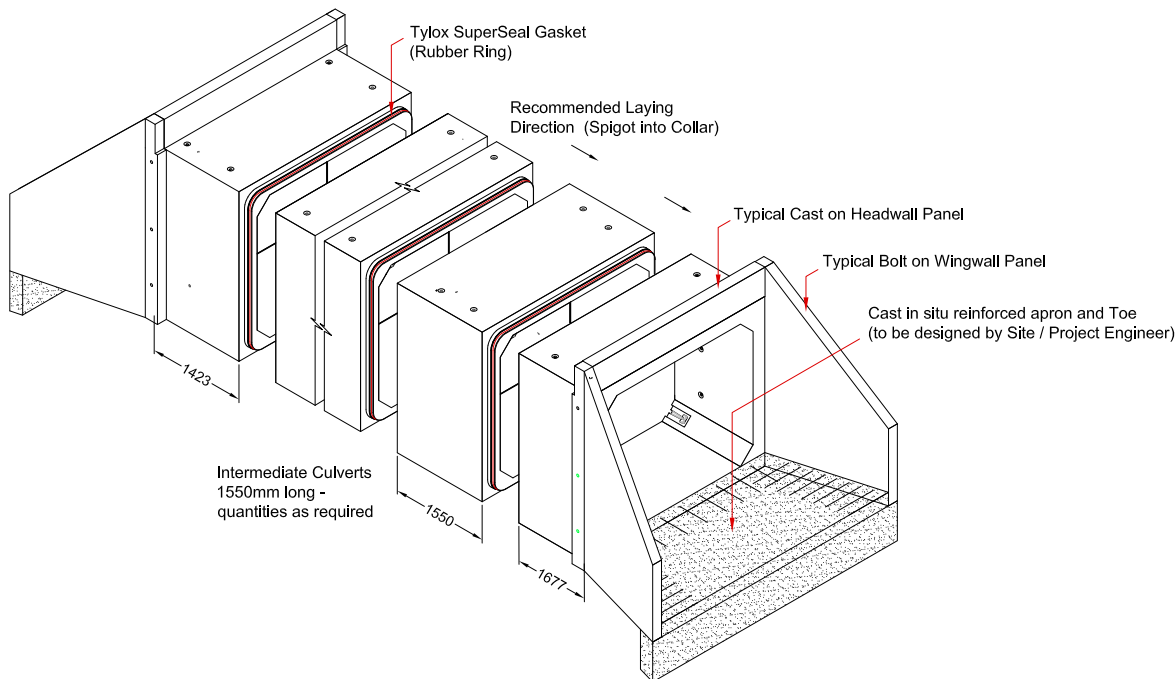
Tunnel, Underpass & Stormwater Culverts
